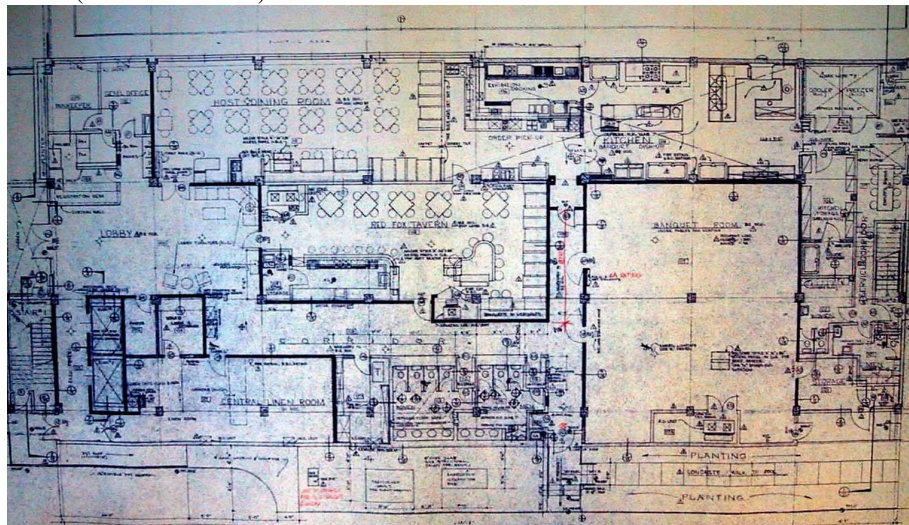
First floor architectural plan (Rissman and Rissman Associates)
